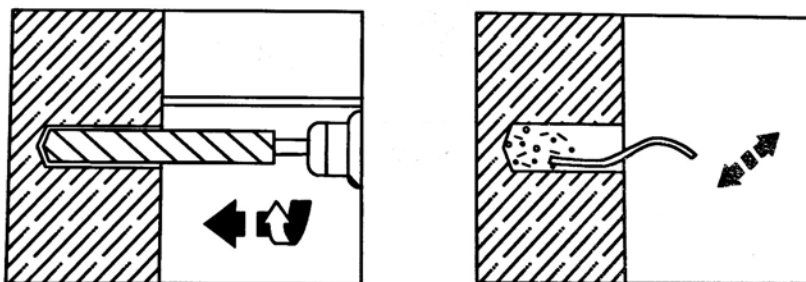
HILTI instruction: Drill anchor hole / blow out (example wall mounting)
